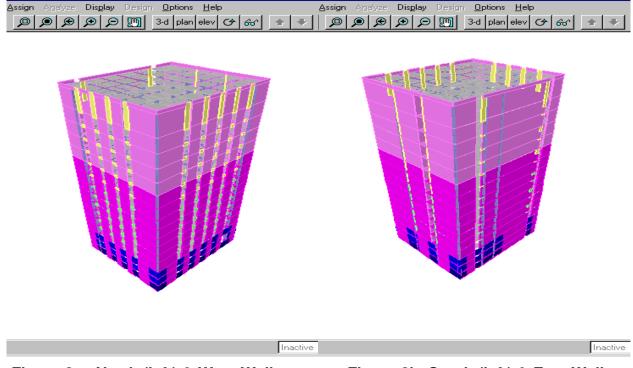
North (left) & West Walls Figure 2b. South (left) & East Walls
